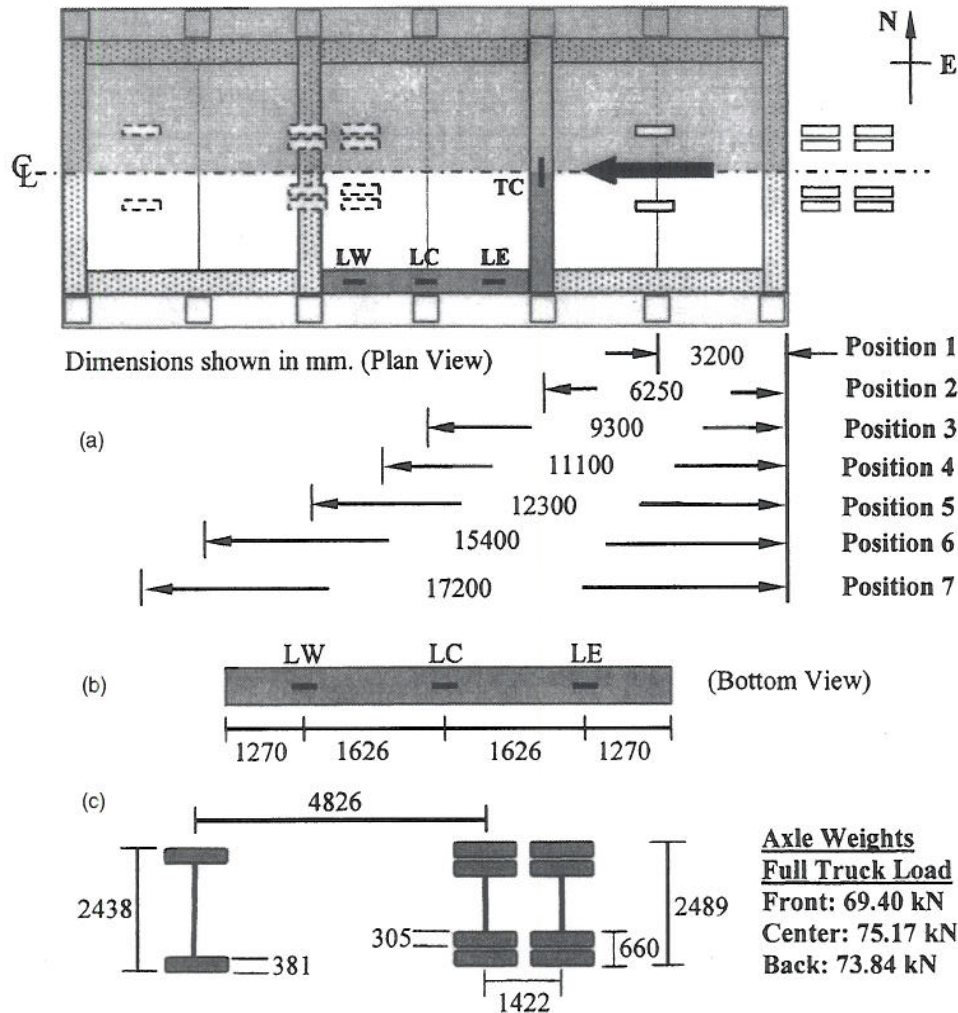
Loading conditions: (a) locations of truck and monitored beams; (b) sensors on longitudinal beam; and (c) truck configuration
